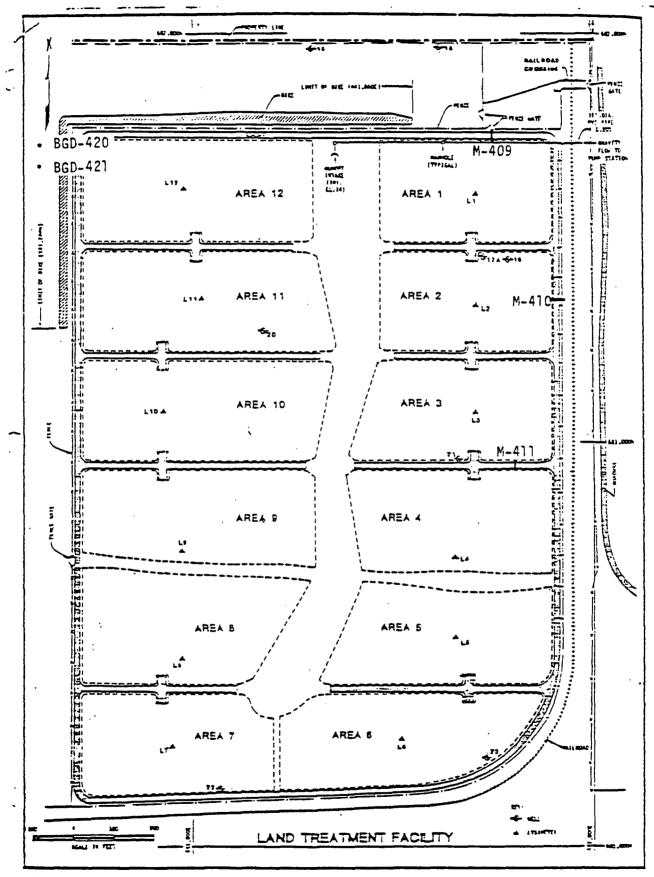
Enlargement of site plot plan showing locations of of land treatment cells and sampling locations for background and unpaved road samples at Site 4.
